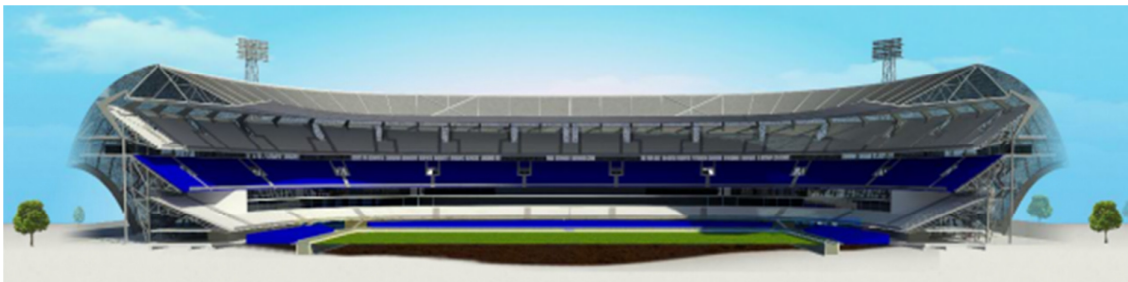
| Section of the 3D render of the renovation plan of Stadion Feijenoord
